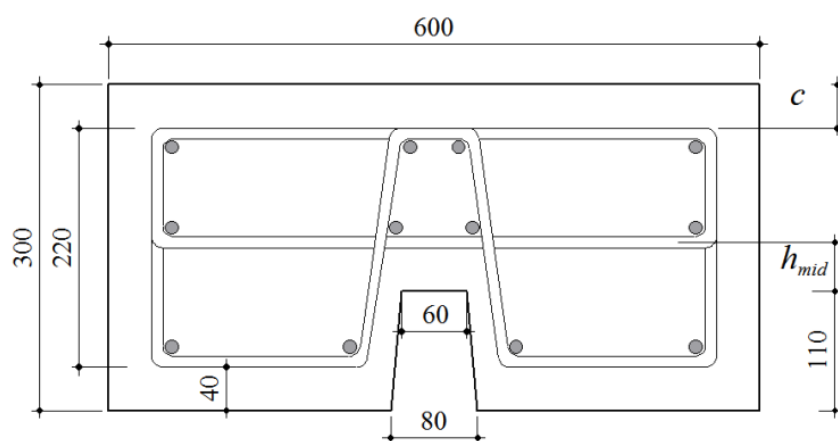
Section of reinforced concrete block used in push-out specimens
